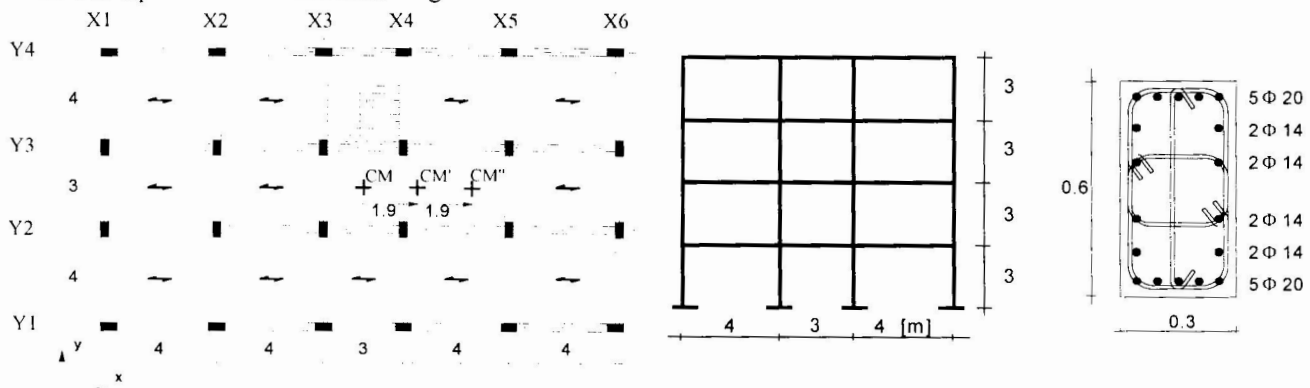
Analyzed building: typical floor plan, elevation and reinforcement of columns in the first and second story.
